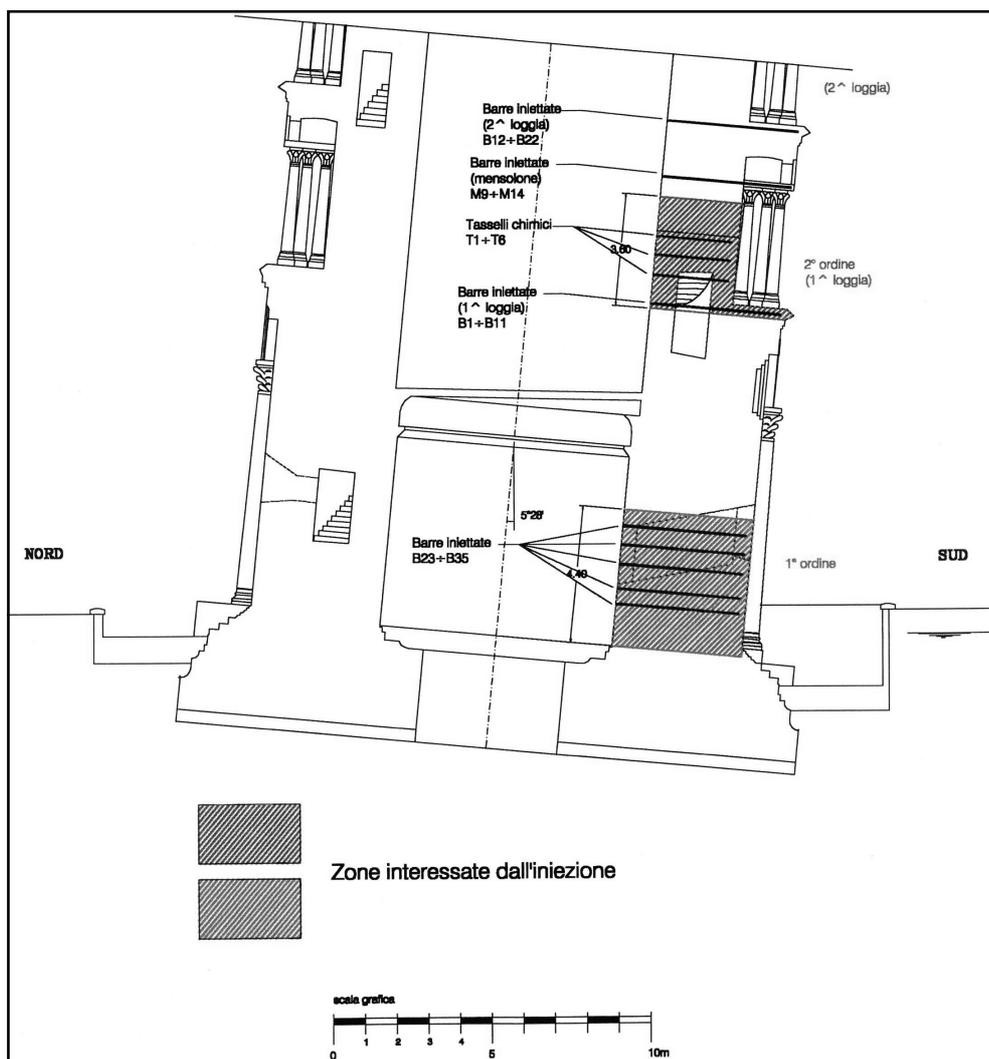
North-South section: view of the intervention by inox bars and grouting.
